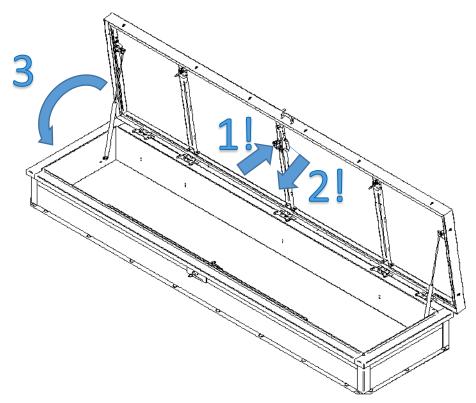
mcr PROROOF ST roof access hatch with type 2 locking mechanism (gas spring-integrated locking mechanism) - closing.
